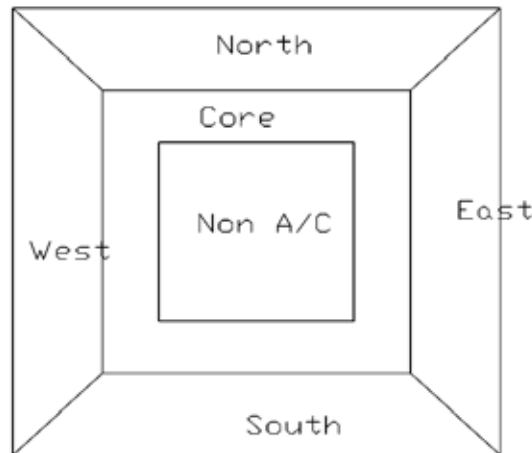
Plan View of the Malaysian Base Case building with 10 floors and 5200 m<sup>2</sup> of total conditioned floor space.
